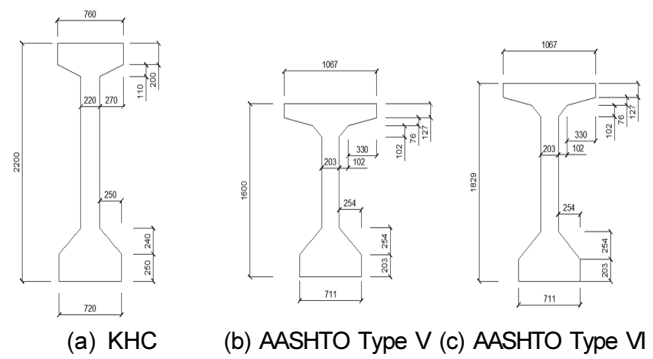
Sections of KHC, AASHTO Type V, and AASHTO Type VI girders (Units: mm)
